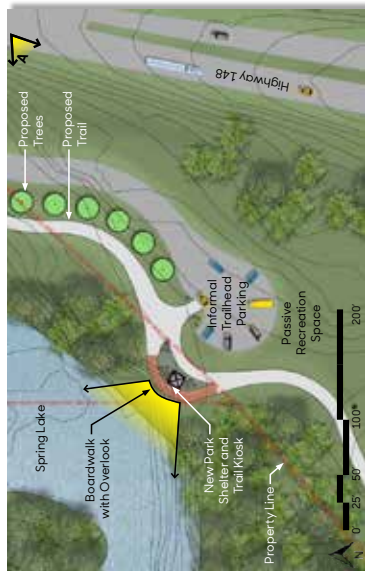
Detail Plan of Spring Lake Park Trailhead.
